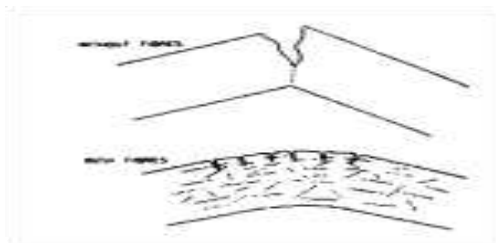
Examination of fractured specimens of fiber-reinforced concrete shows that failure takes place primarily due to fiber pull-out or debonding
